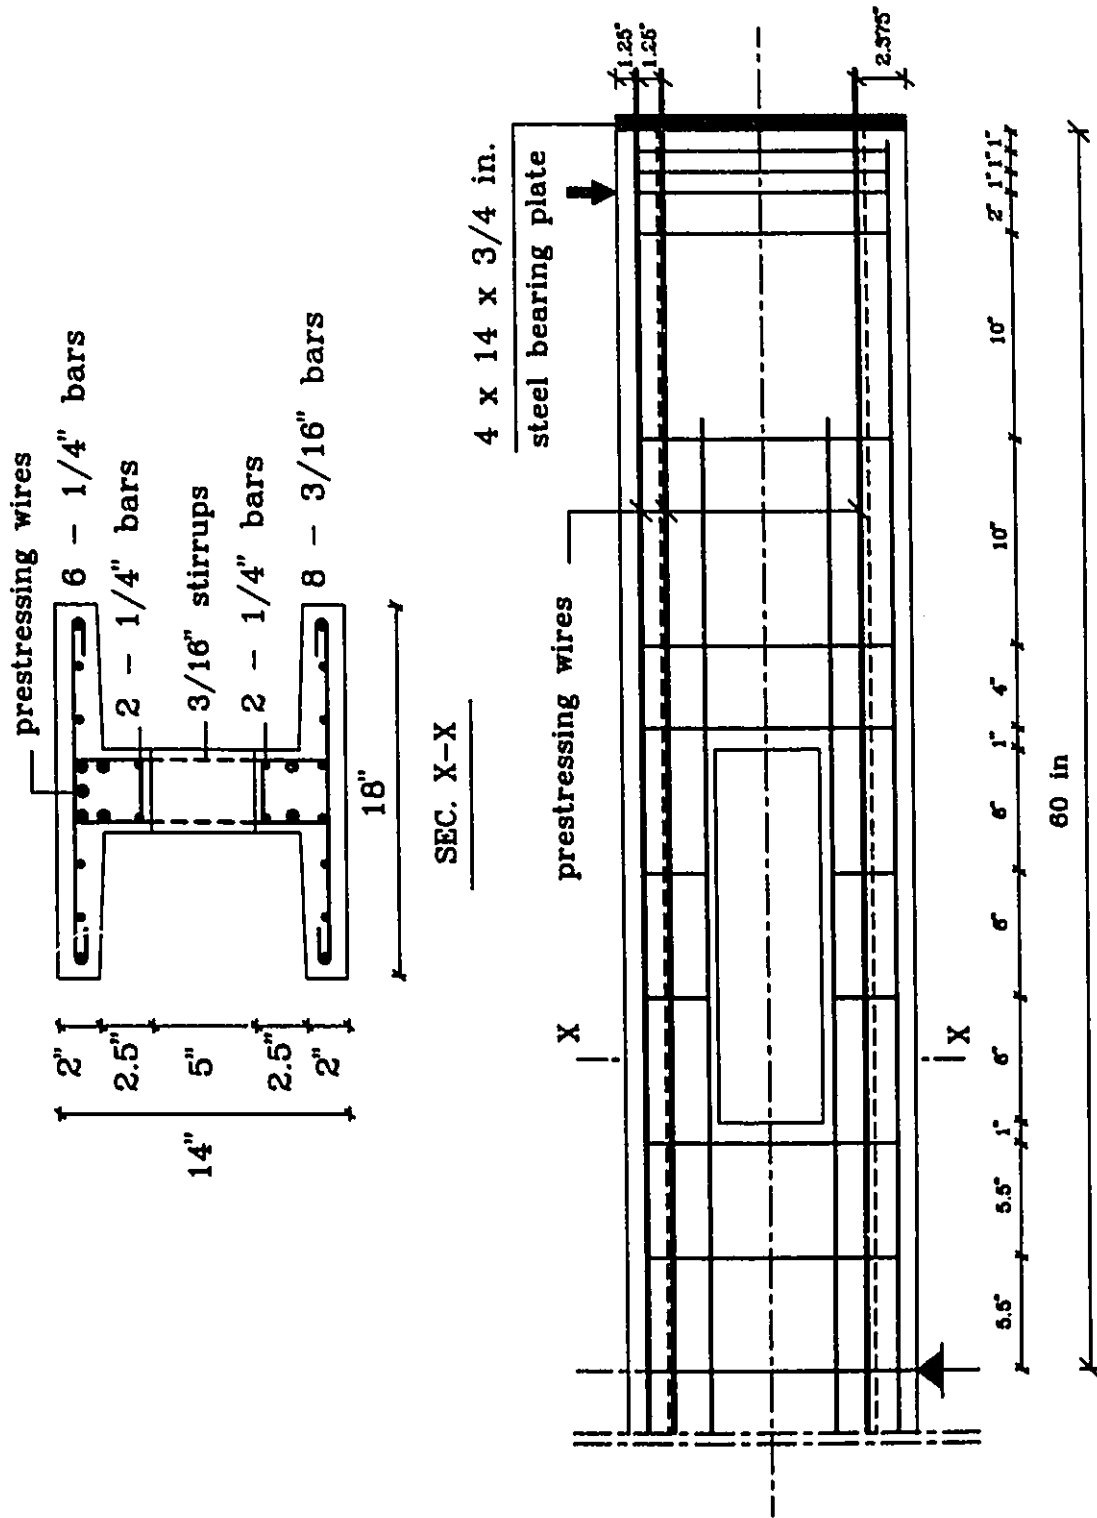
REINFORCEMENT DETAILS FOR BEAM BIII1A
